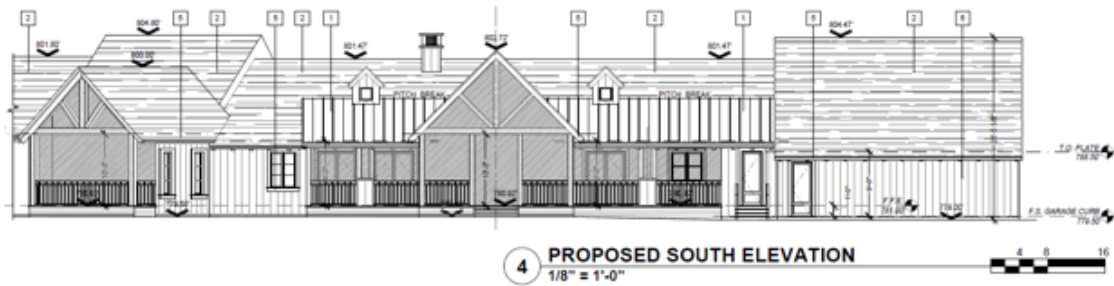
Proposed Elevation (Secondary Residence – ADU)
